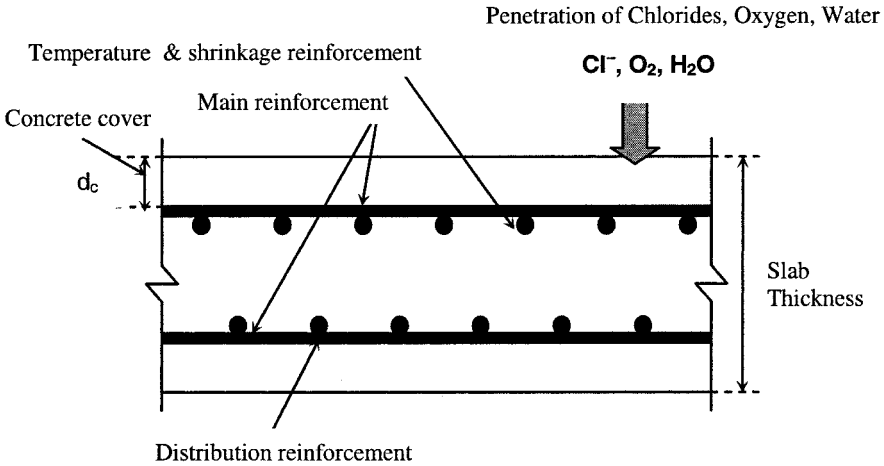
Typical reinforcement details of a bridge deck subjected to aggressive agents
